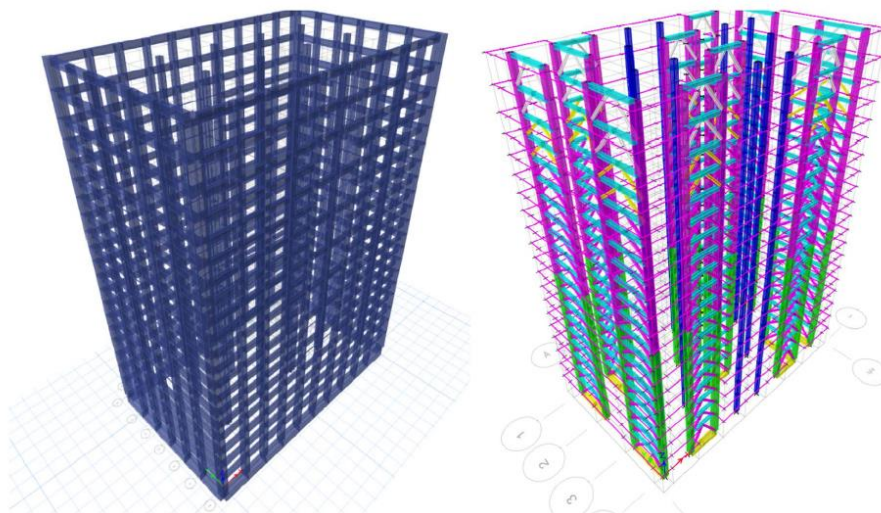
Concrete (left) and mass timber (right) ETABS model (Timmers and Tsay Jacobs, 2018)
